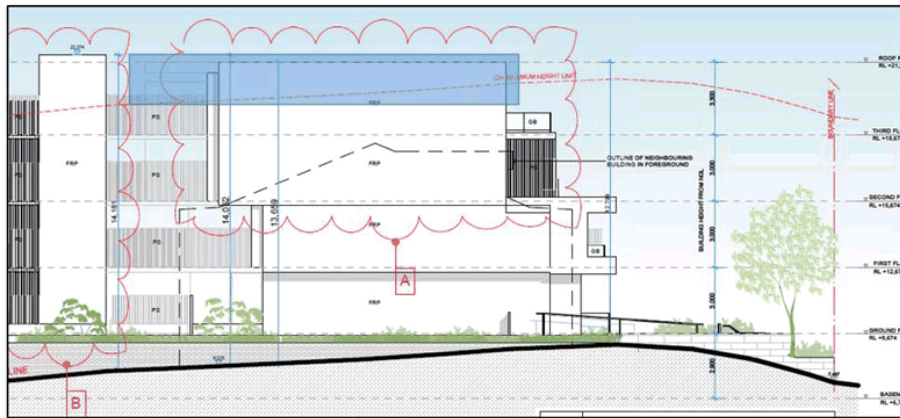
West Elevation plan extract with area of height non-compliance not supported shown in blue
